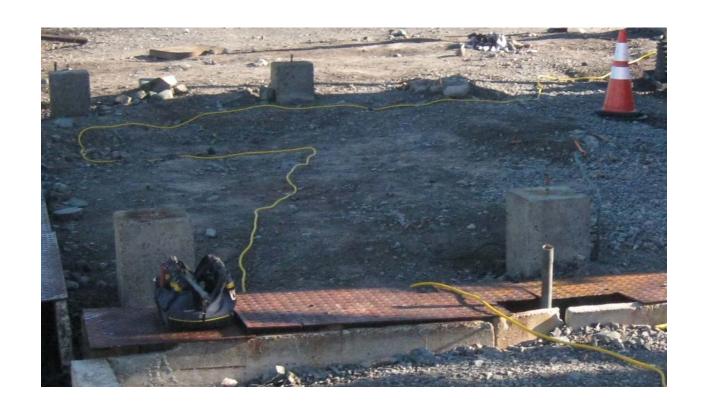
230kV Disconnect B1T1-1 Foundation Removal
